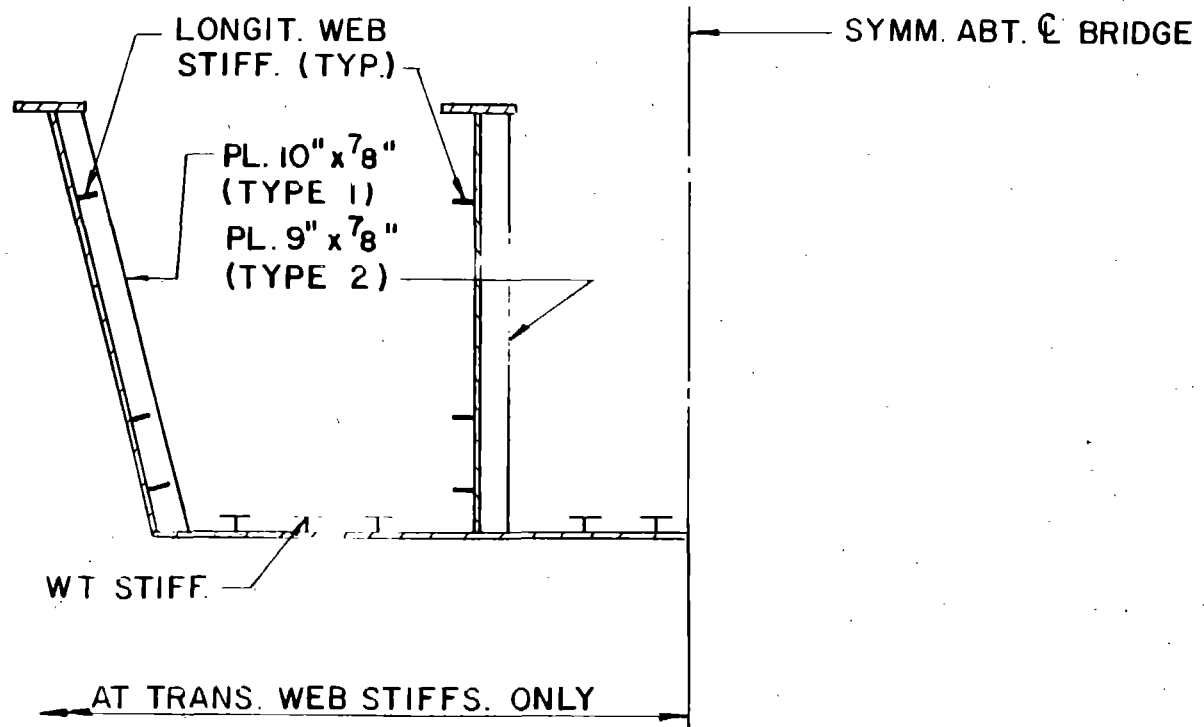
TYPICAL CROSS SECTION - PROPOSED SPECIFICATION INTERMEDIATE SPAN
